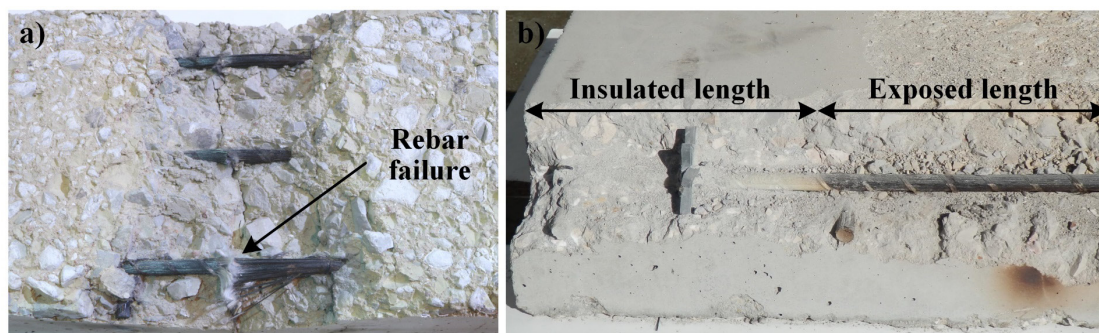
Slab SC-C2.5-D10 after the fire resistance test: (a) detail of rebar failure, and (b) damage in longitudinal reinforcement (bottom view).
